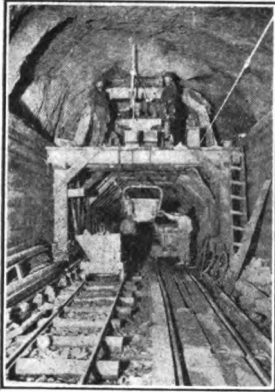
VIEW OF TRAVELING CONCRETE FORMS FOR TUNNEL LINING.
